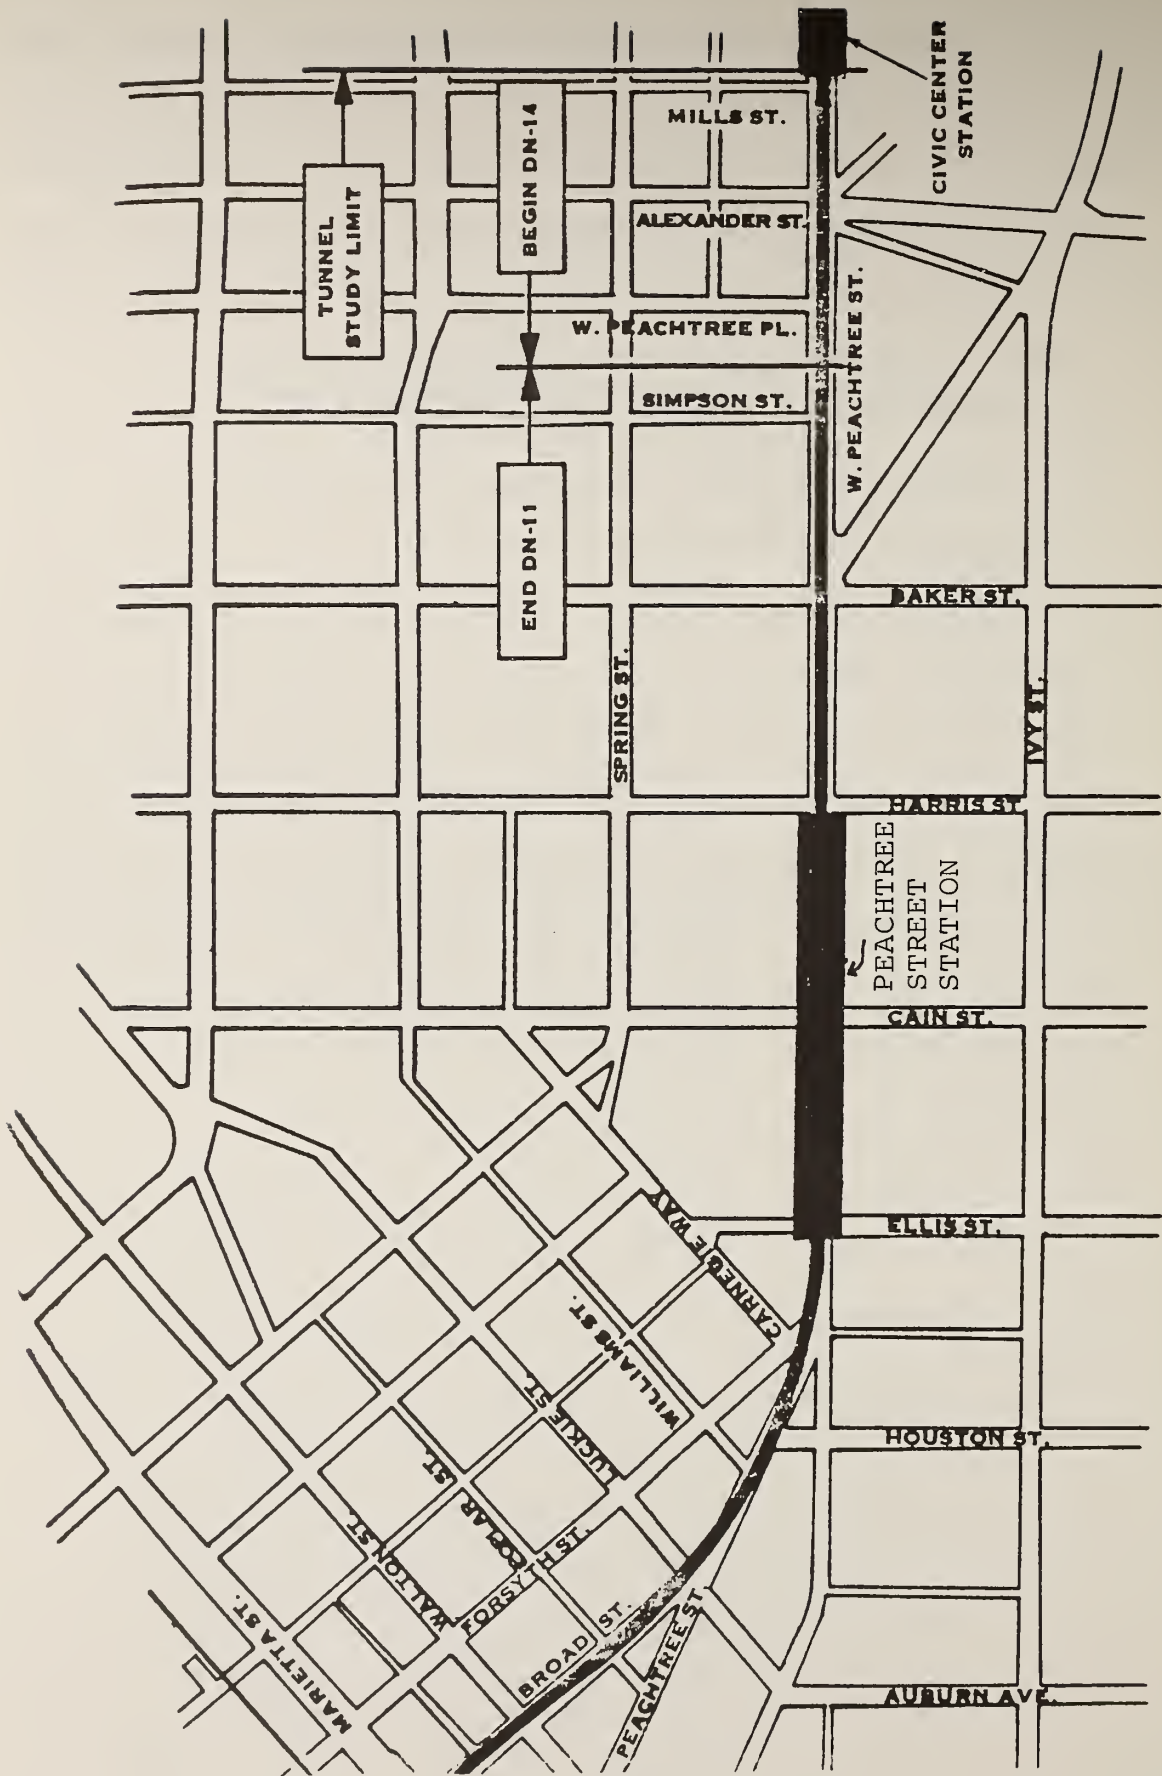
PROJECT LOCATION PLAN (FROM LAW ENGINEERING TESTING COMPANY, 1976)
